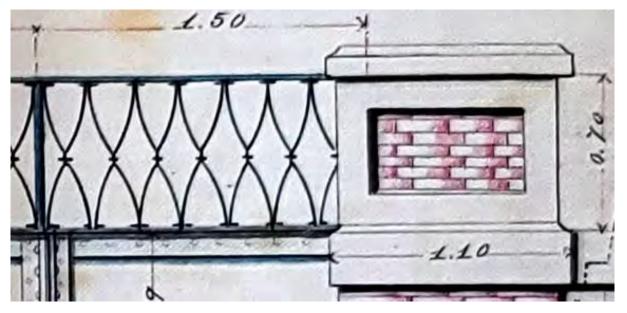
Above, a partial zoom of Pedro Fernandez's 1892 drawing for the metal safety railings, very similar to the final construction found in a reduced group of culverts, bridges and pontones, all in near proximity to each other in the Ponce-Adjuntas Section of Carretera Núm. 6 (See, Section 7).
